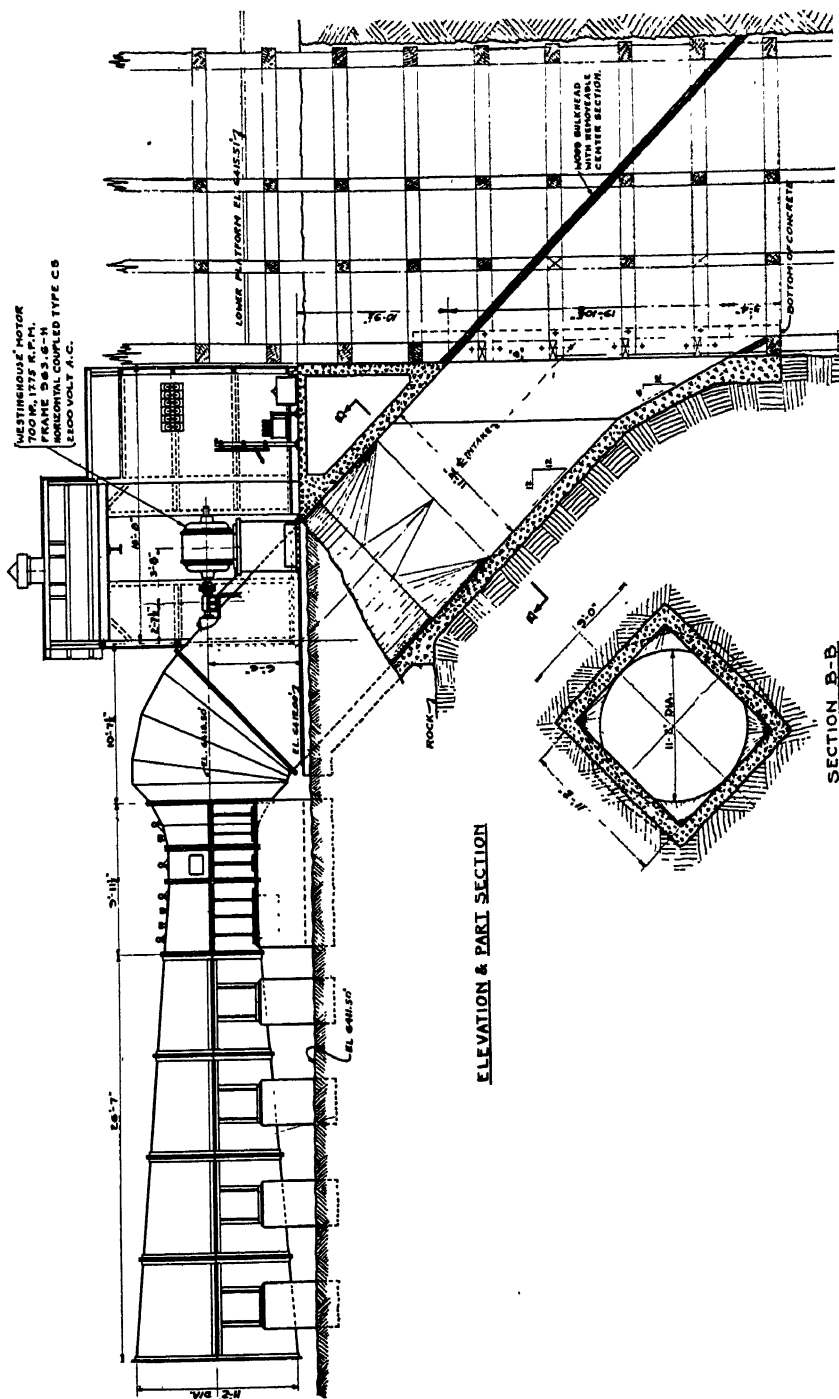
GENERAL ARRANGEMENT OF FAN.
